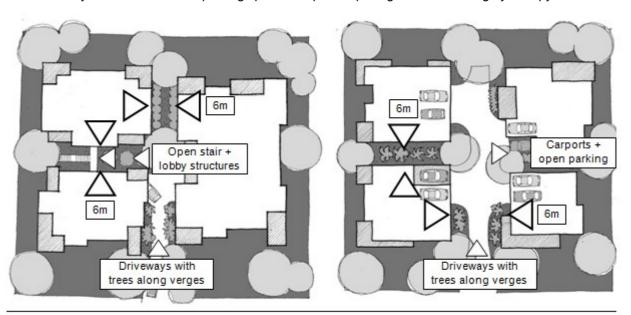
MINIMUM SEPARATION BETWEEN BUILDINGS
